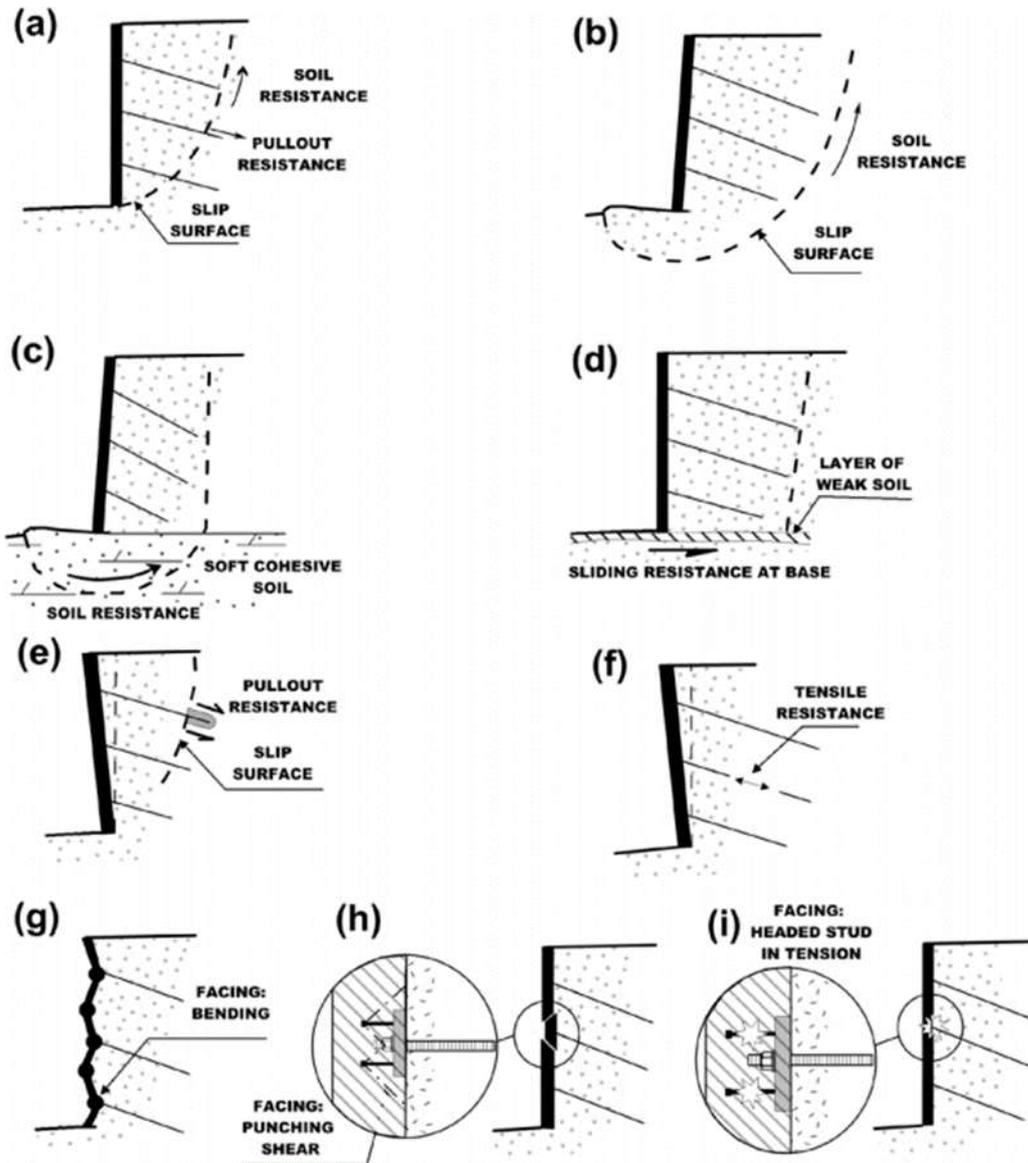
Examples of limit states of soil nailed structures: (a) internal rotational stability; (b) external rotational stability; (c) basal heave; (d) translational failure (sliding); (e) soil nail pull-out; (f) soil nail tensile failure; (g) bending of the facing; (h) punching shear in the facing; (i) head plate failure
